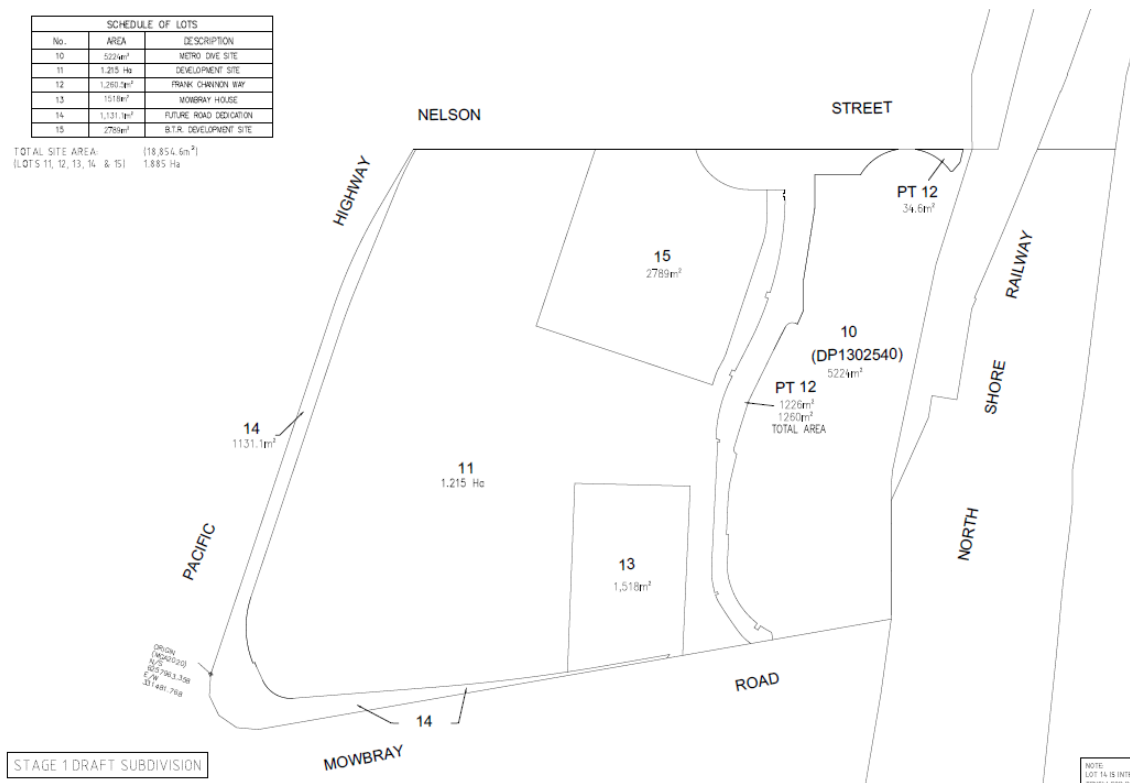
Proposed Subdivision Plan (Source: Adam Richardson)
